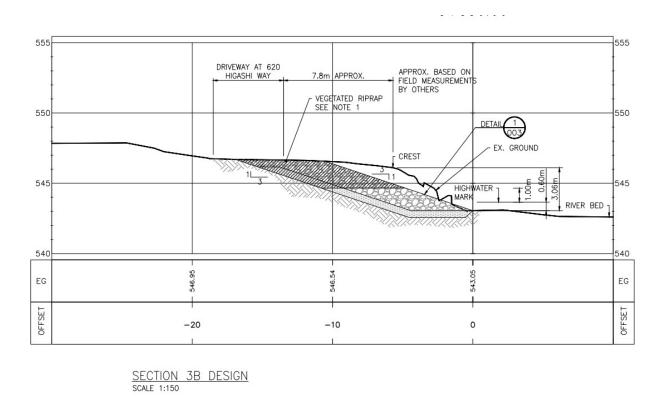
Bank stabilisation design for Kaslo River in Lot A, 620 Higashi Way. View looking downstream.
